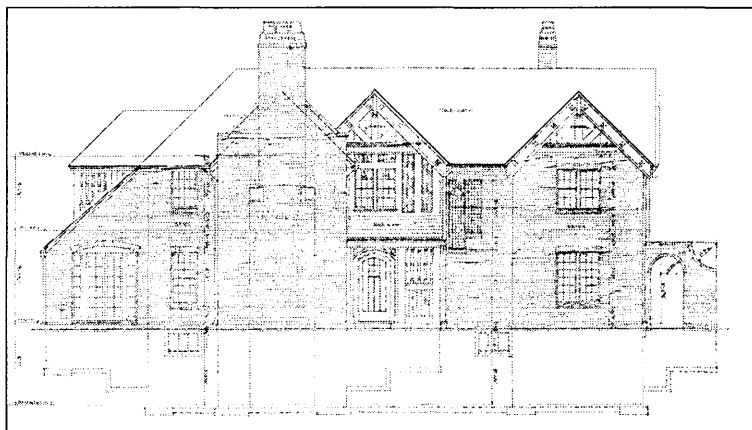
4230 Foster Drive, Architect's Elevation Plan, Frank Comfort House
